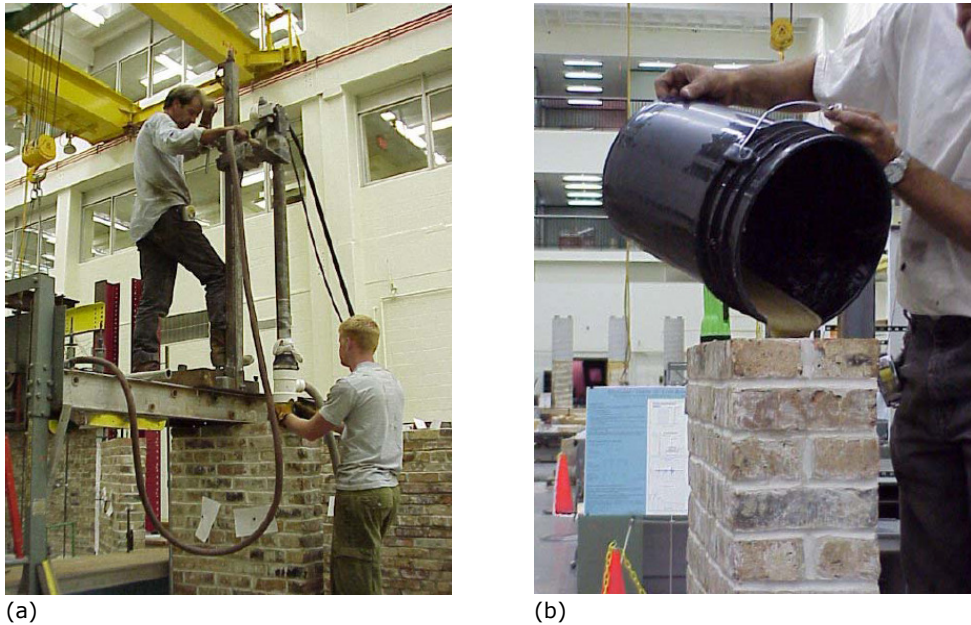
(a) Holes drilling and (b) grouting for centre-core rehabilitation in laboratory [78]
